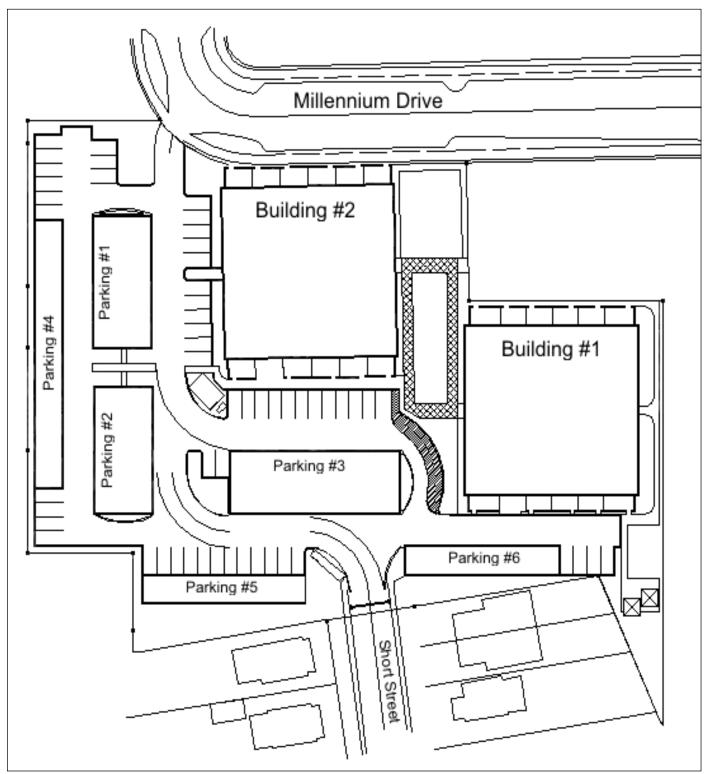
Site plan of Seagram Lofts including the two residential buildings, and the six parking garages (adapted from a drawing provided by L.Alan Grinham Architects)
